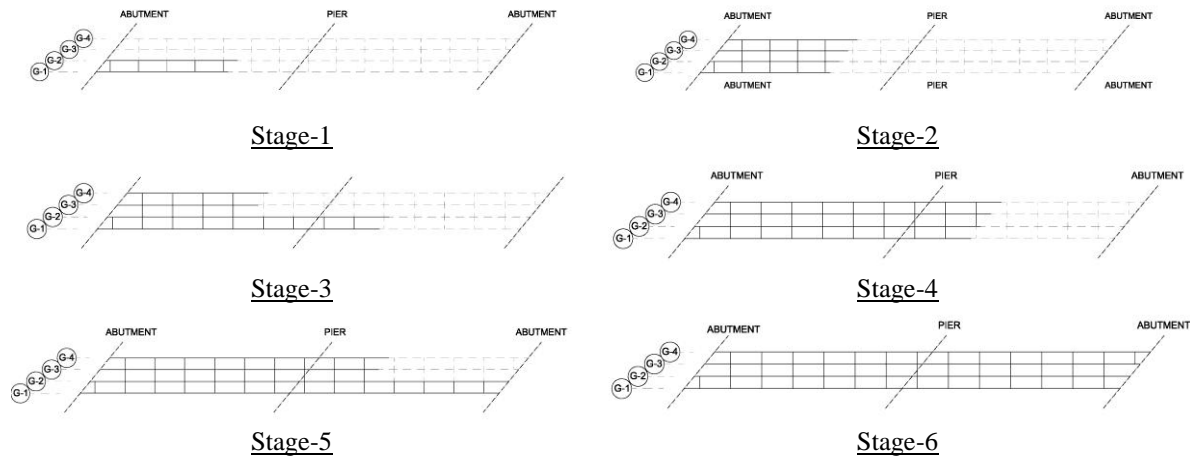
Stage 1 to Stage 6 of Construction for Paired-Girder Erection of Two Equal-Span, 4-Girder Bridges.
